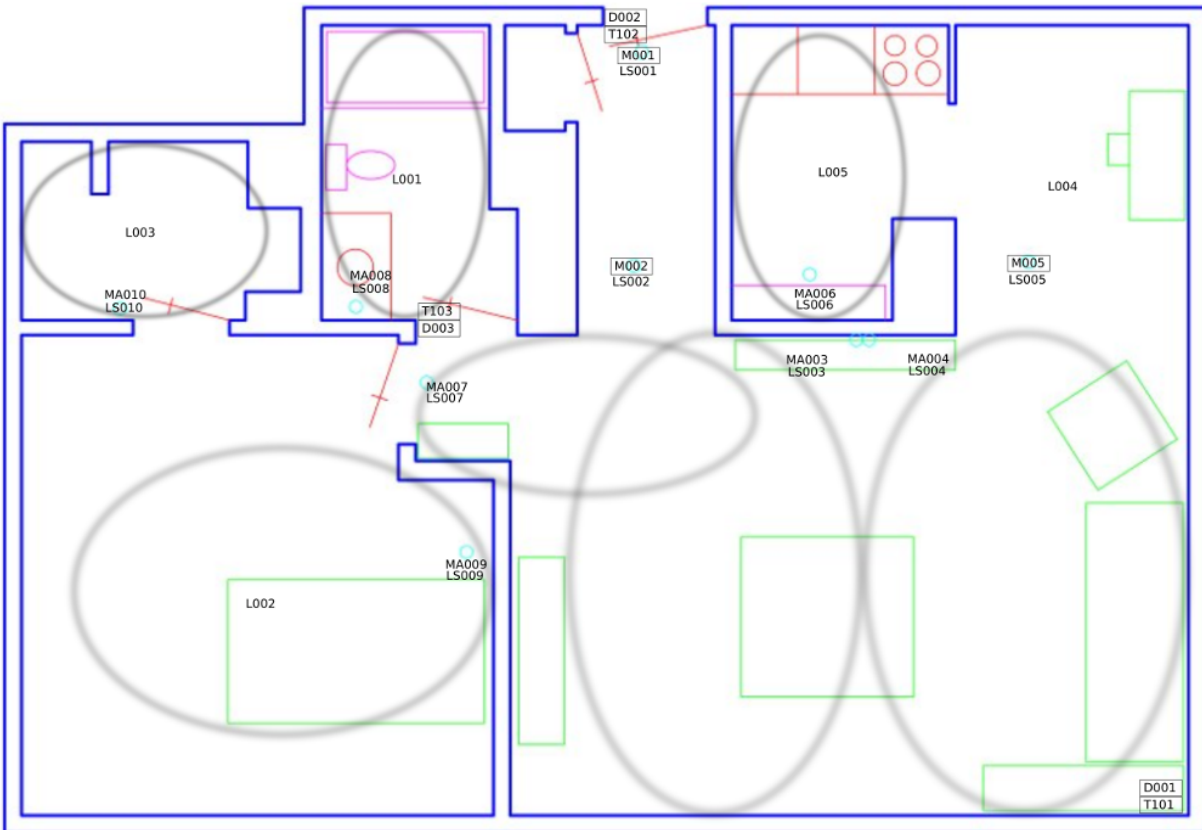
Floor plan and sensor placement for the testbed hh103.
